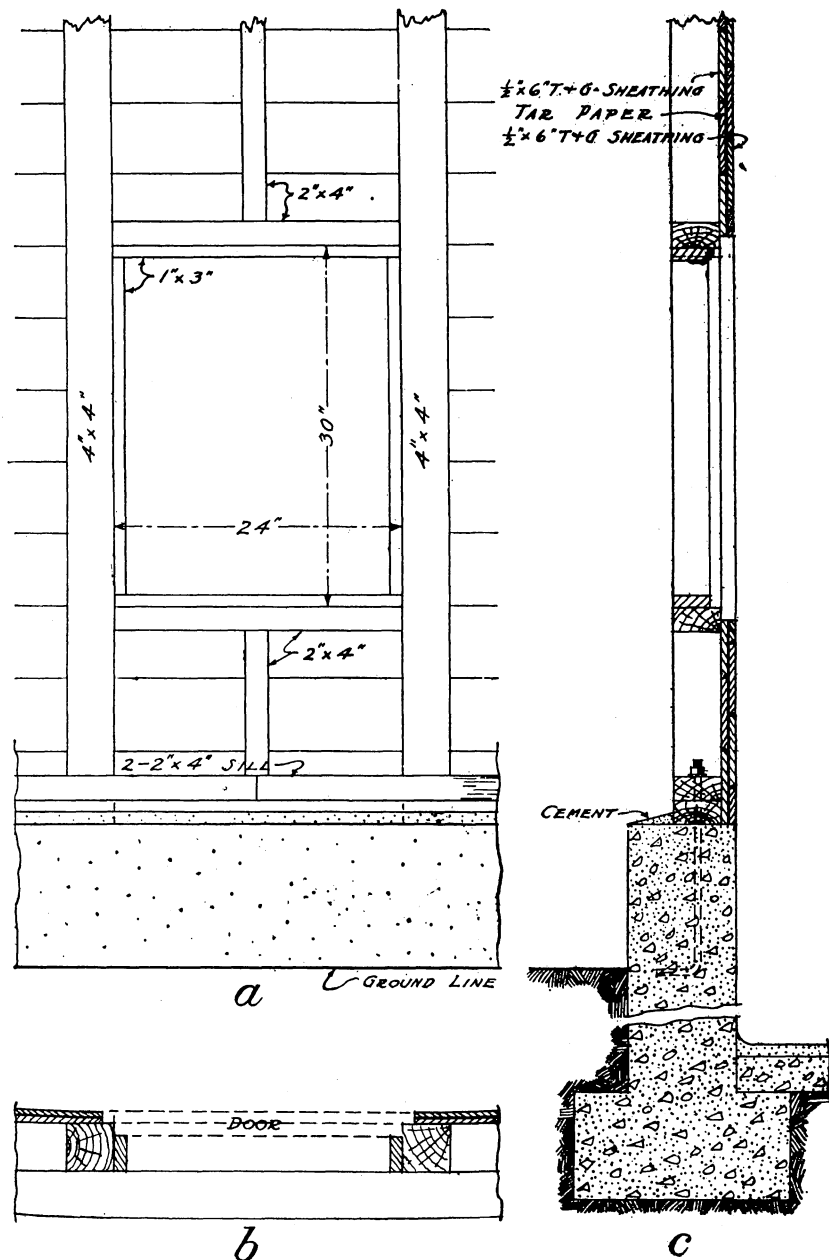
Details of construction of modified Wisconsin silo; a and b, detail of door opening; c, sectional view of foundation and wall.
